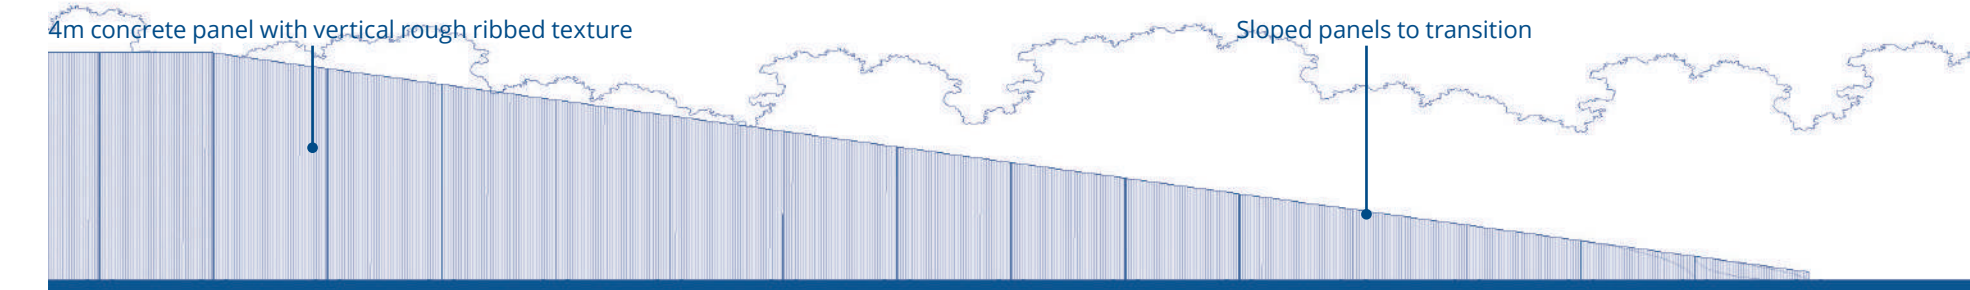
\_ Proposed elevation - North embankment noise barrier transition
